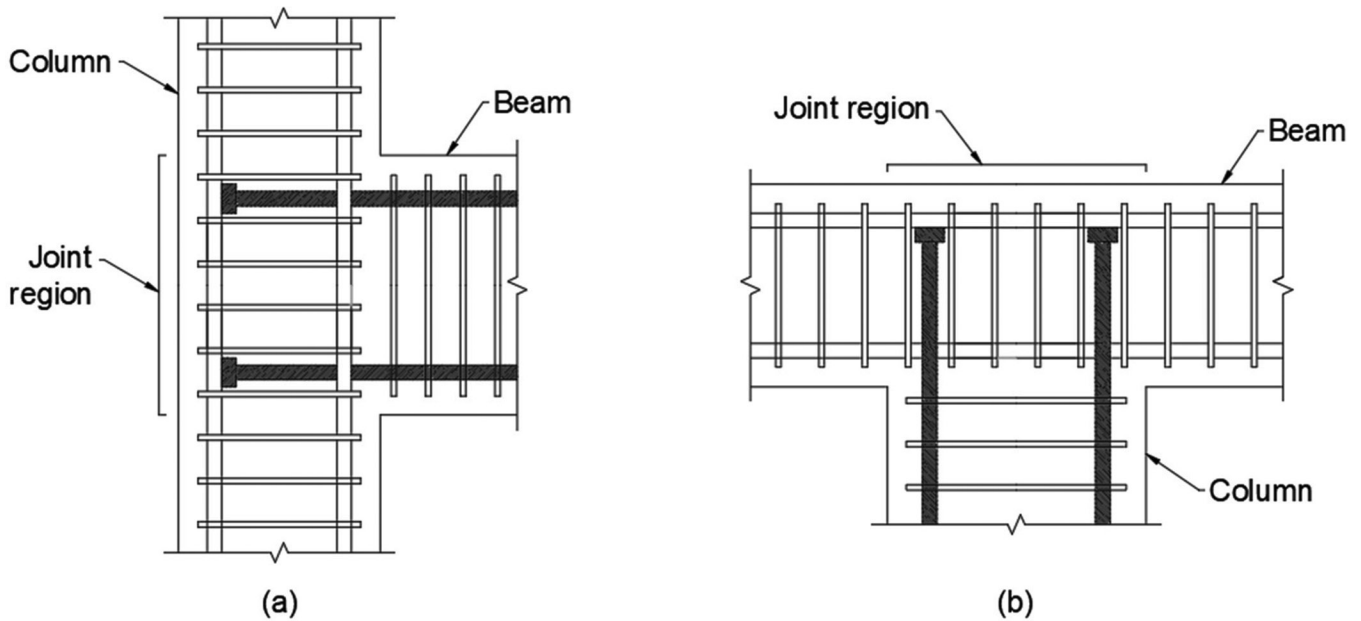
(a) Exterior beam-column joint with beam reinforcement anchored in column using headed bars; and (b) roof-level interior beam-column joint with column reinforcement anchored in beam using headed bars.
